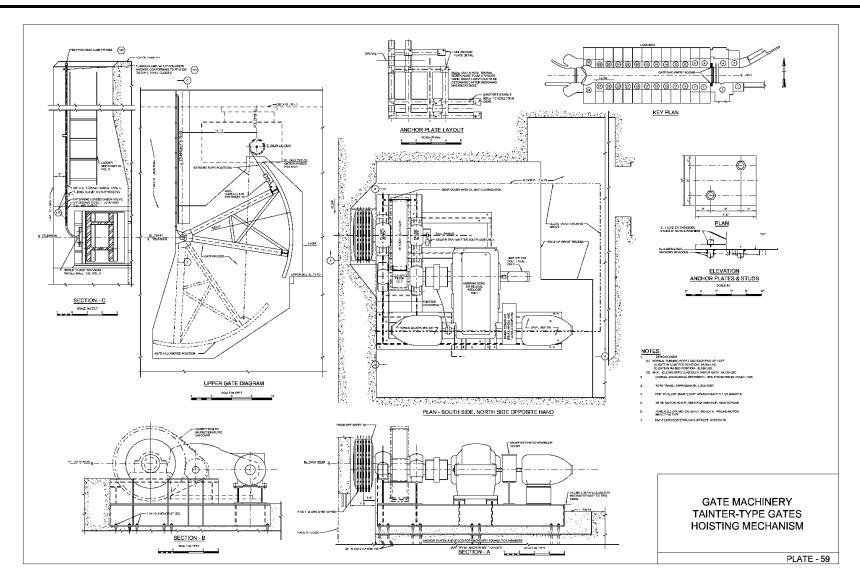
Plate 59: Gate machinery, tainter-type gates, hoisting mechanism
